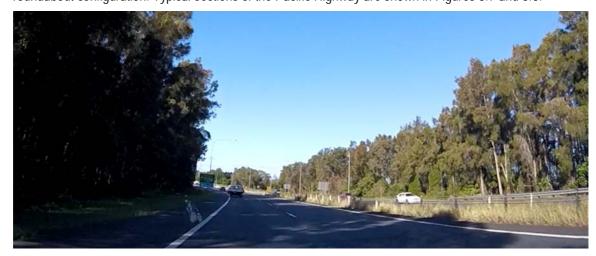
Pacific Highway Typical Section South of Tweed Coast Road (northbound)
